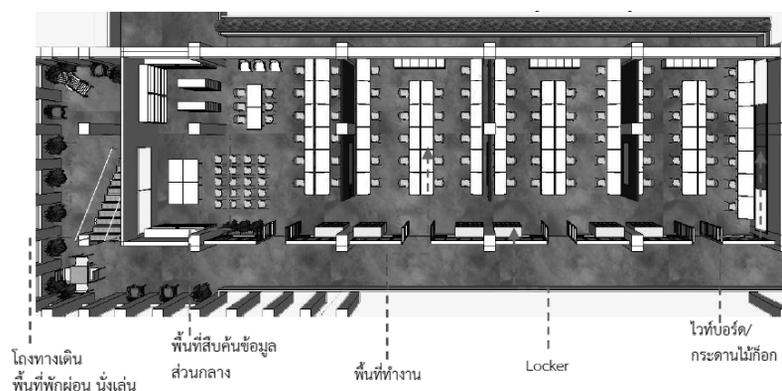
Furniture lay out AR-412-1/AR-412-2 (Floor 4) studio type.2
